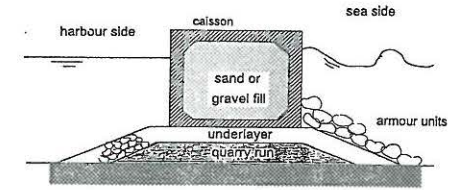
Schematic cross section of caisson breakwater on rubble mound
